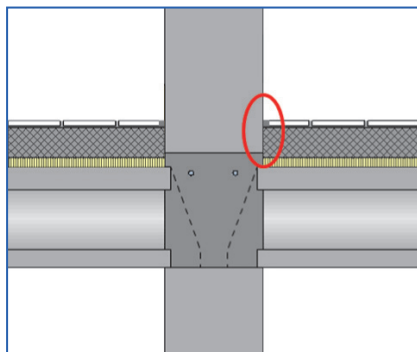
Heavy floating floors with unintended connection to the wall is a typical workmanship error.
